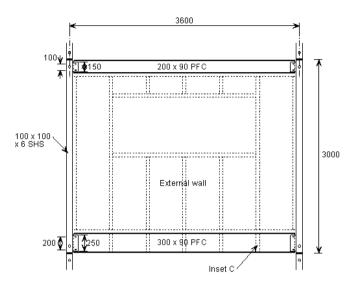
Structural Frame of an Open-Sided Module (SteelConstruction.info, 2012).
